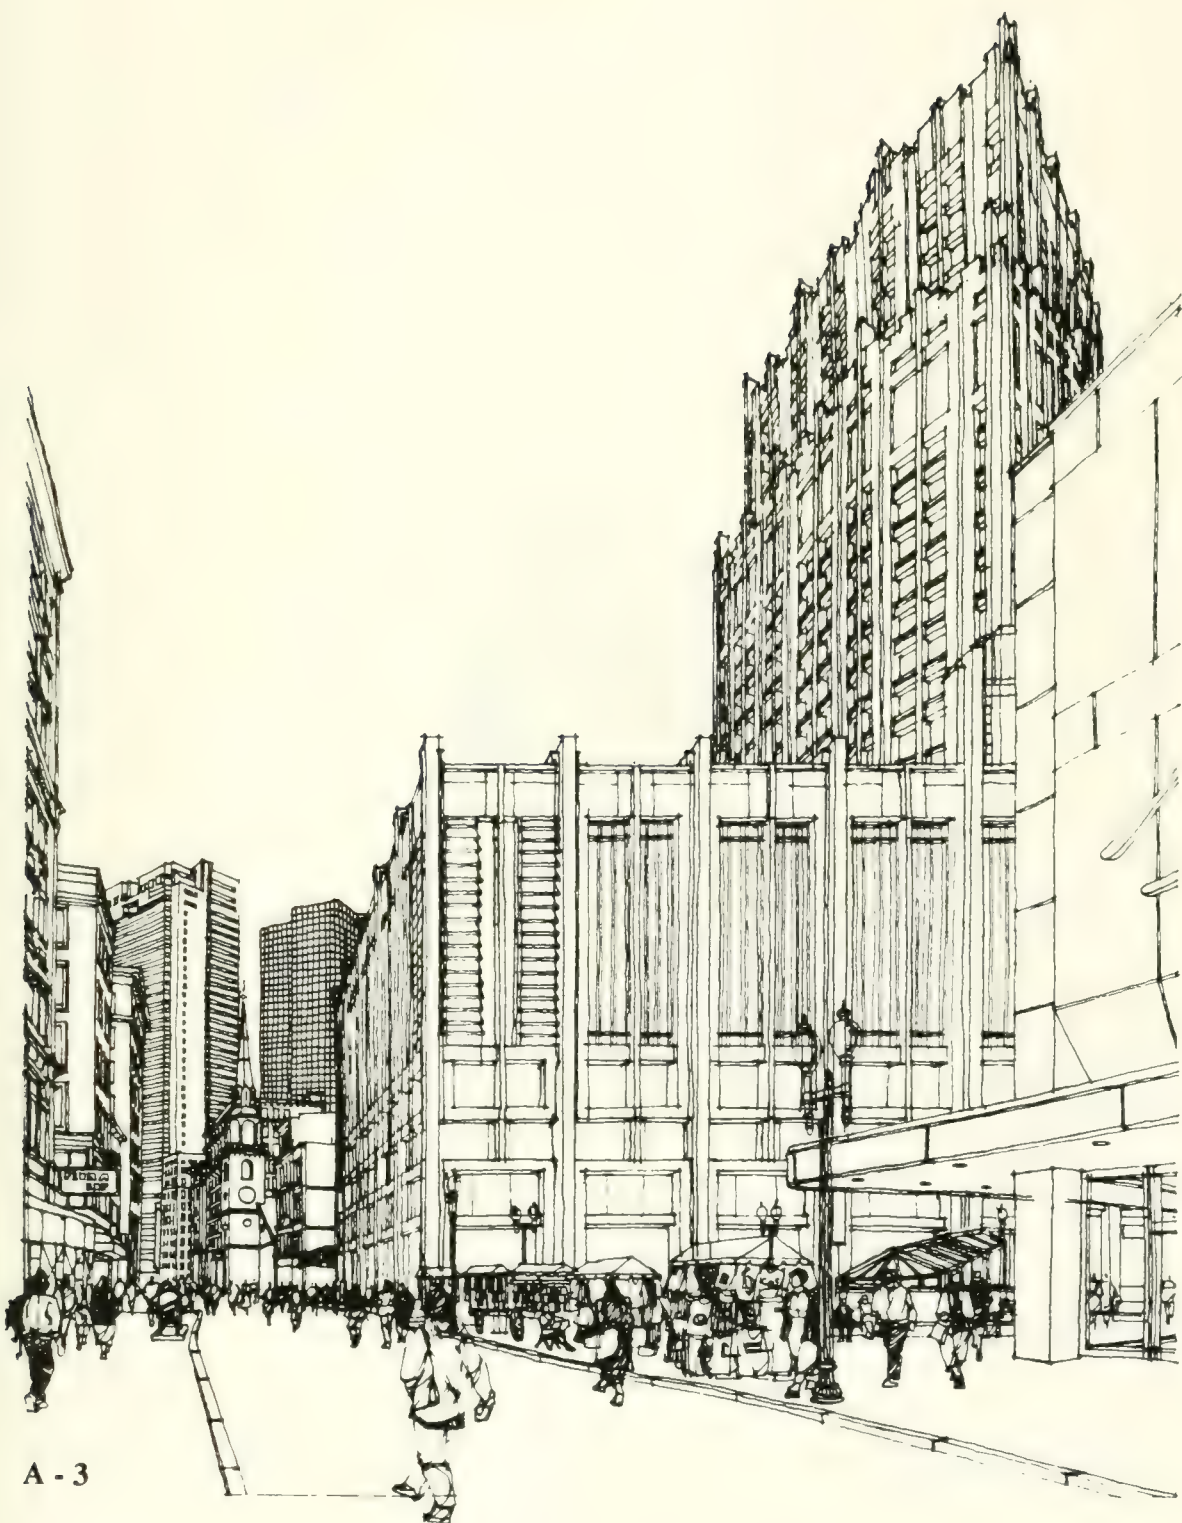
through V.5.13 provide the view taken from Washington Street in front of the newest wing of Filene's and looks north on Washington Street. The view is framed by the corner of Filene's on the right and the Jewelers Building on the left. The Washington Street edge of Filene's Park with its MBTA kiosk is clearly shown in front of the prominent Franklin Street facade of the existing building. Two high towers, Devonshire Tower and 53 State Street, are clearly visible in the background on the left behind the Old South Meeting House, and the Shawmut Bank tower is prominent on the right, above the existing building.
